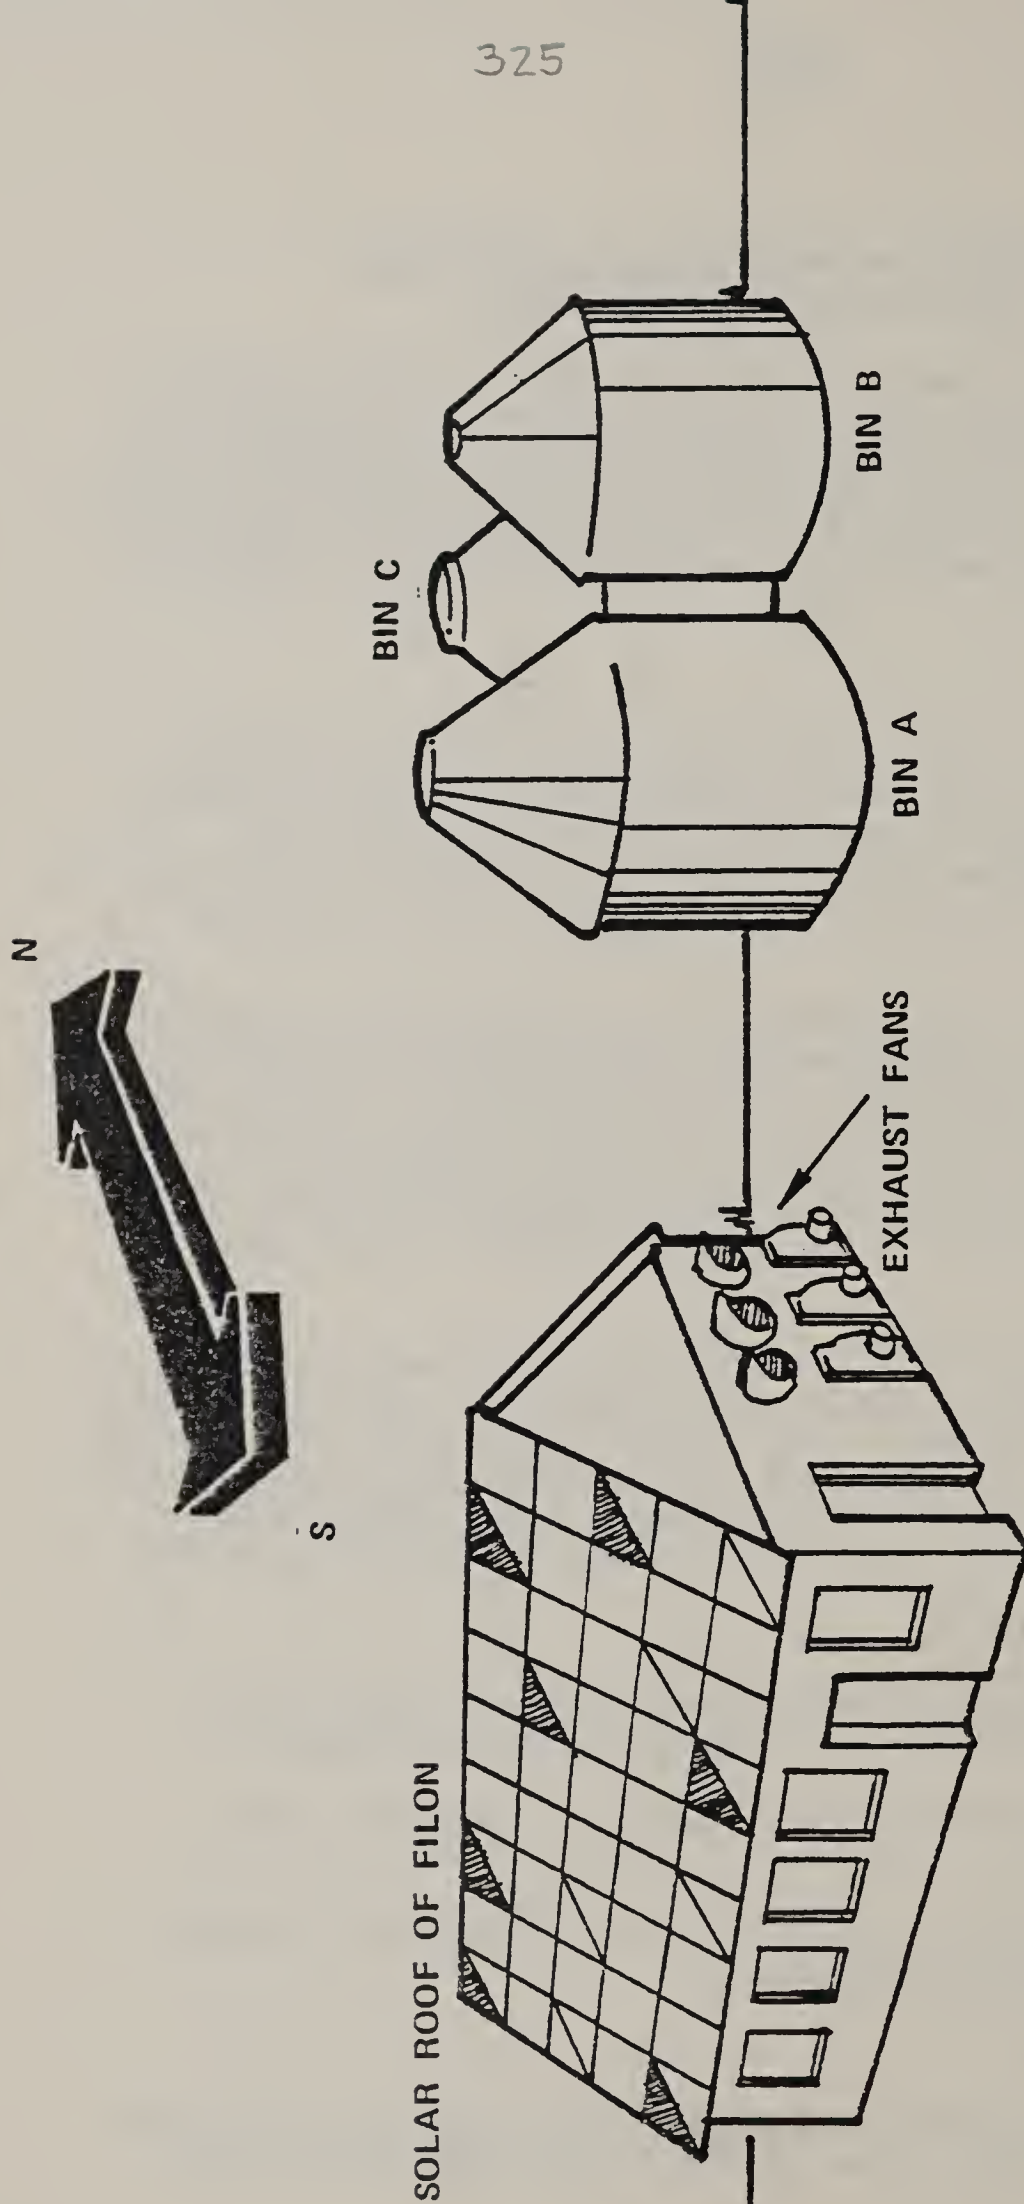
ARRANGEMENT OF OFFICE/LIVESTOCK BUILDING AND DRYING BINS ON THE KEMPTON FARM.
